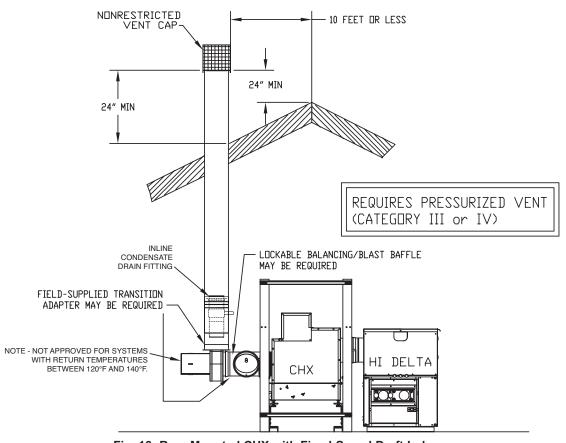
Rear-Mounted CHX with Fixed-Speed Draft Inducer
